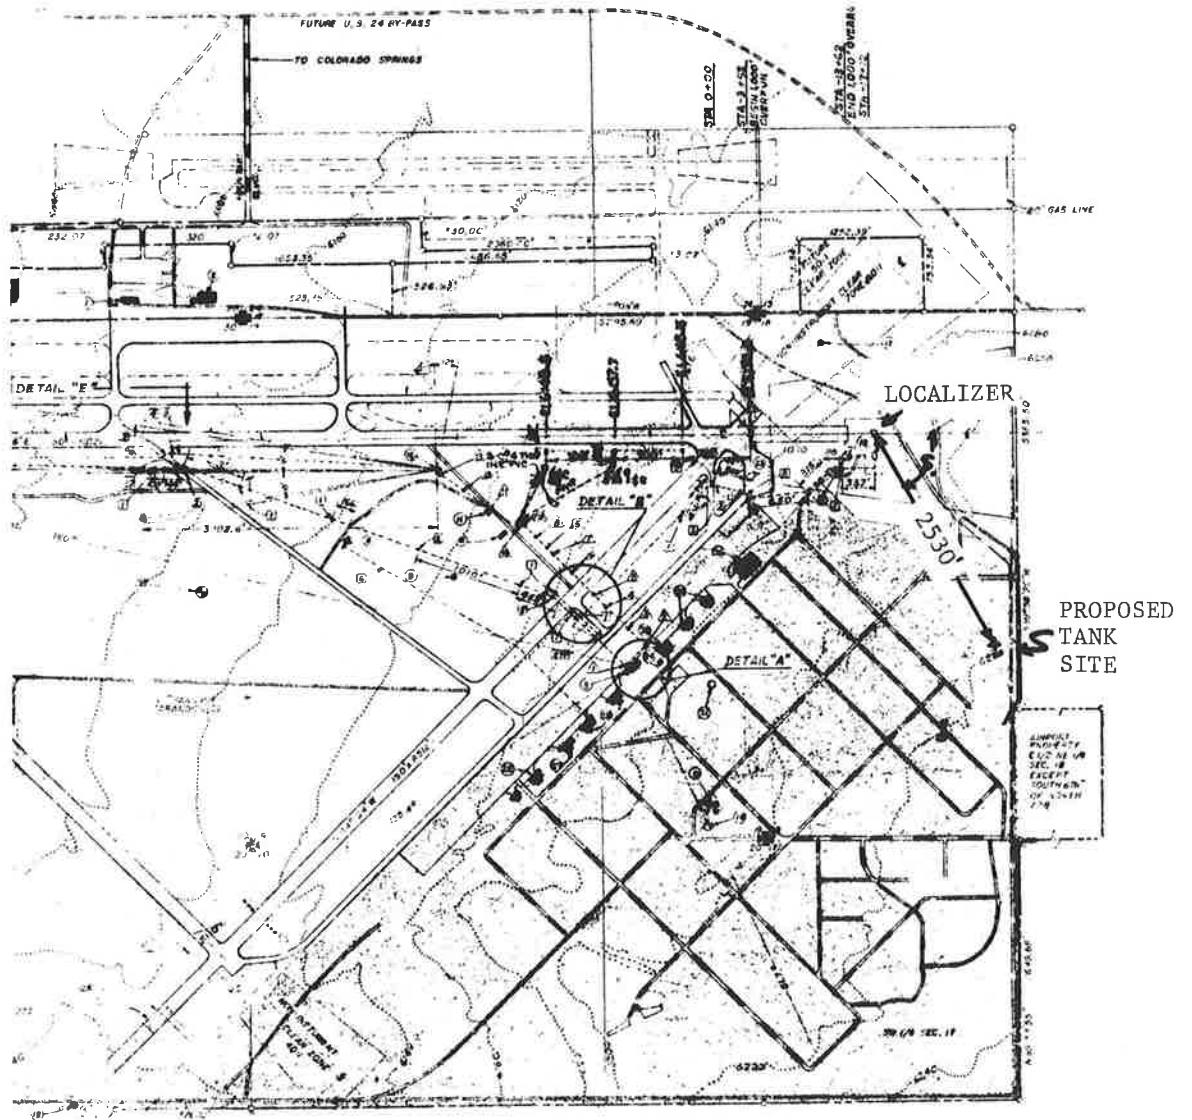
Airport Layout Plan Showing Location of Localizer, Runway and Proposed Water Tank Site
